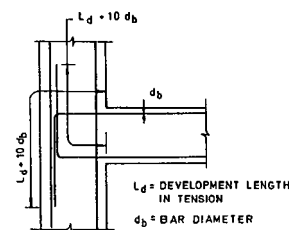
Anchorage of beam bars in an external joint (IS 13920:1993)
